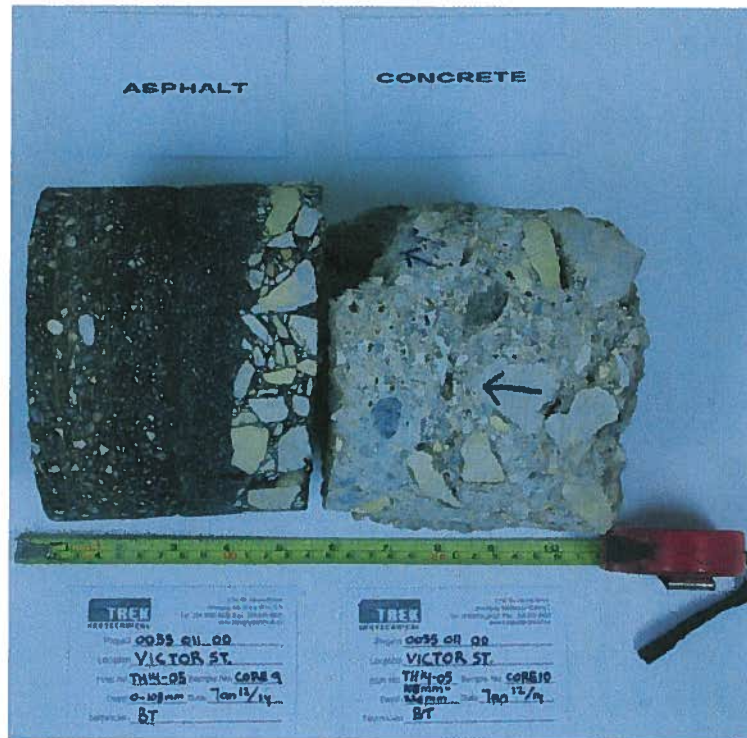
Asphalt and Concrete Core Sample from Test Hole TH14-05
